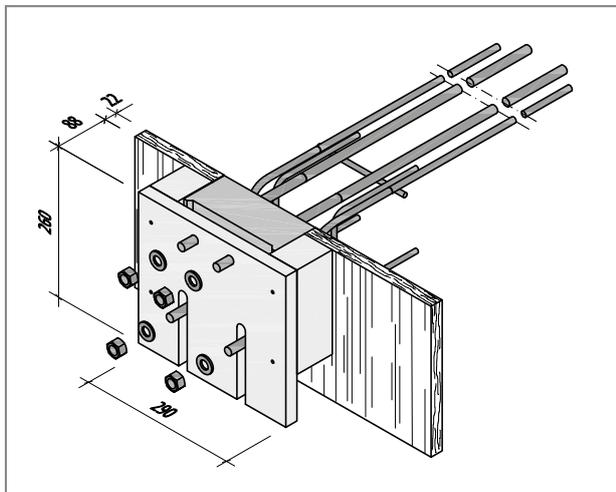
Schöck Isokorb® type KS: Representation with installation aid
